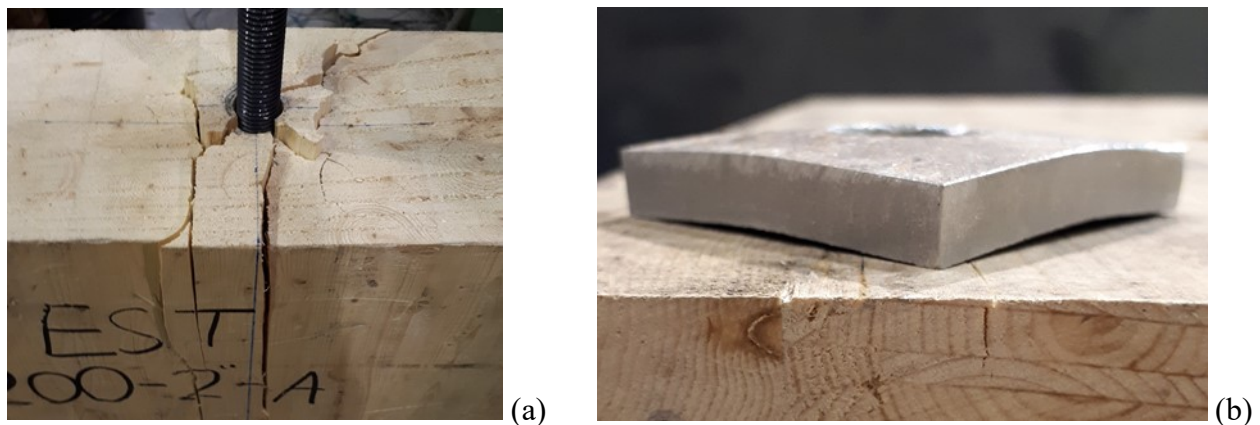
Failure mode of Test 200-2.0 replicates: (a) Rod pull-out shearing along carved out hole with 45-degree cracks and beam splitting; (b) Yielded 8-mm thick washer.
